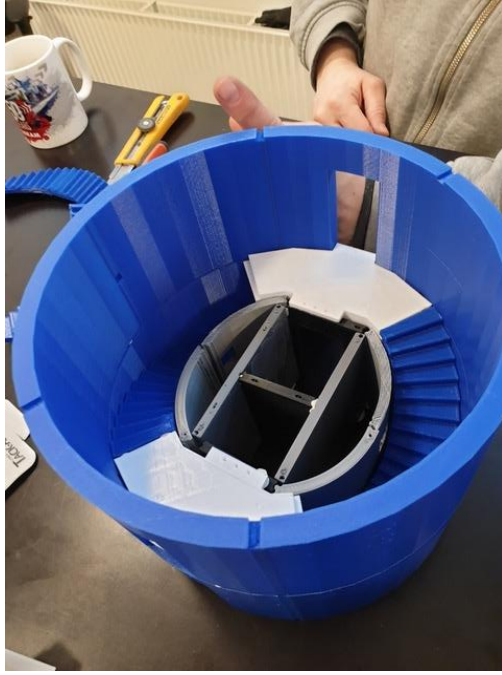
A Place To – Core wall as built and 3D printed © NCC / Industribeton
